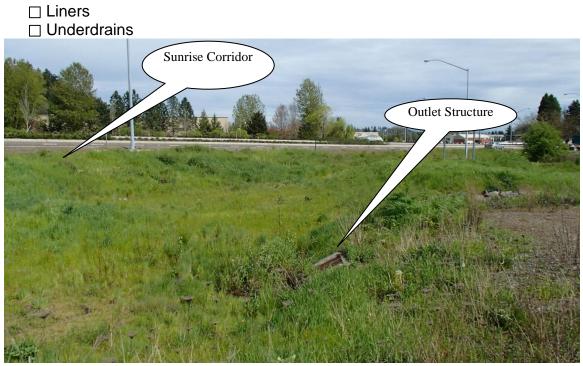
a view of bio-retention pond looking East toward Sunrise Corridor.
